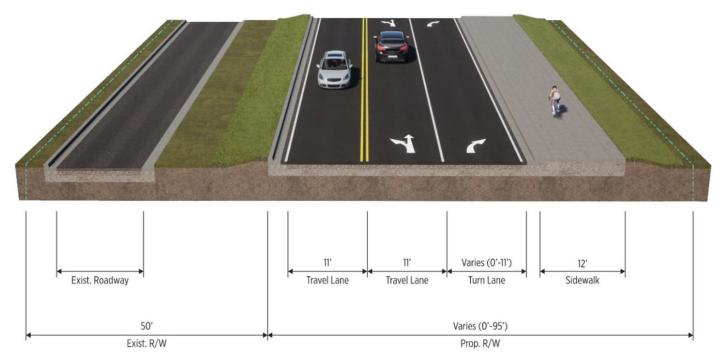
St. Joe Road/Suwanee Way Typical Section
